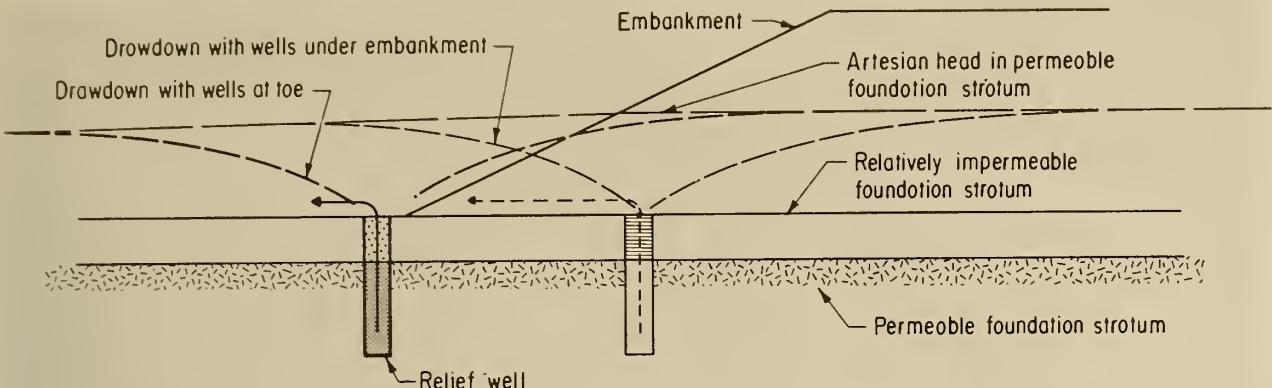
Pumping wells for hydraulic barrier and relief wells.
